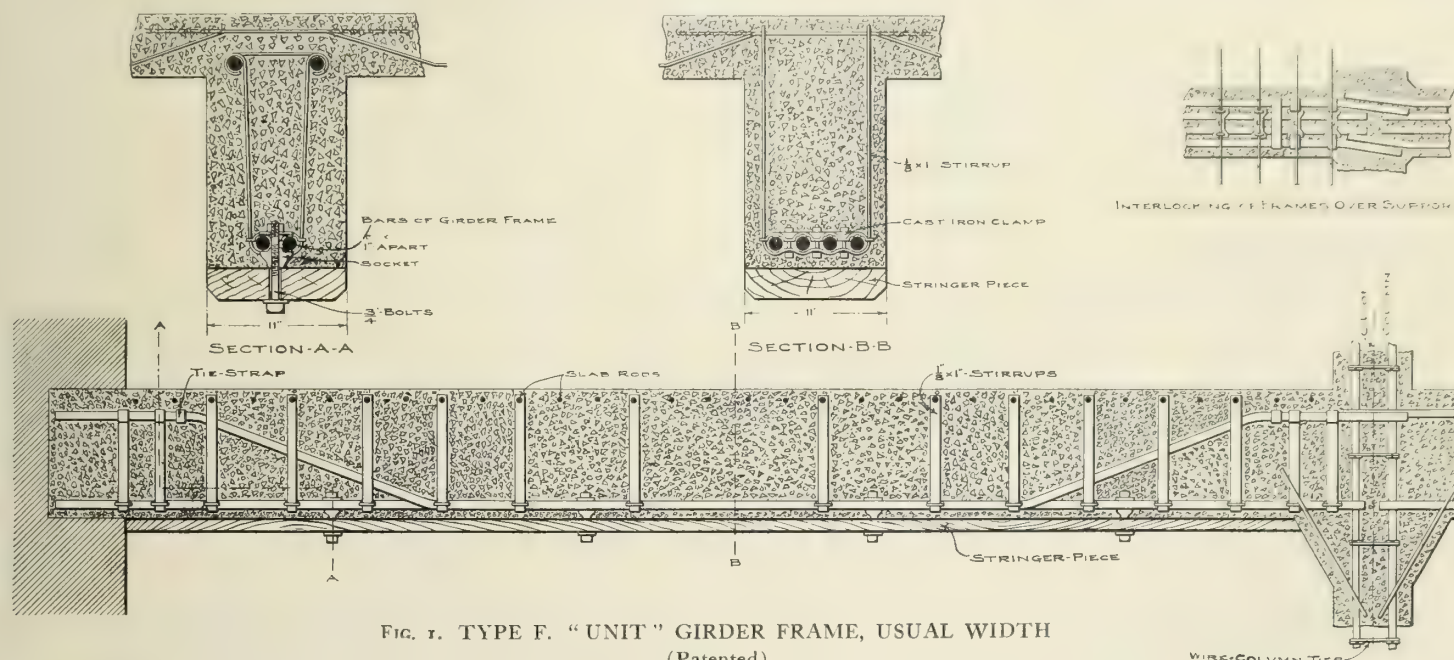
TYPE F. "UNIT" GIRDER FRAME, USUAL WIDTH
